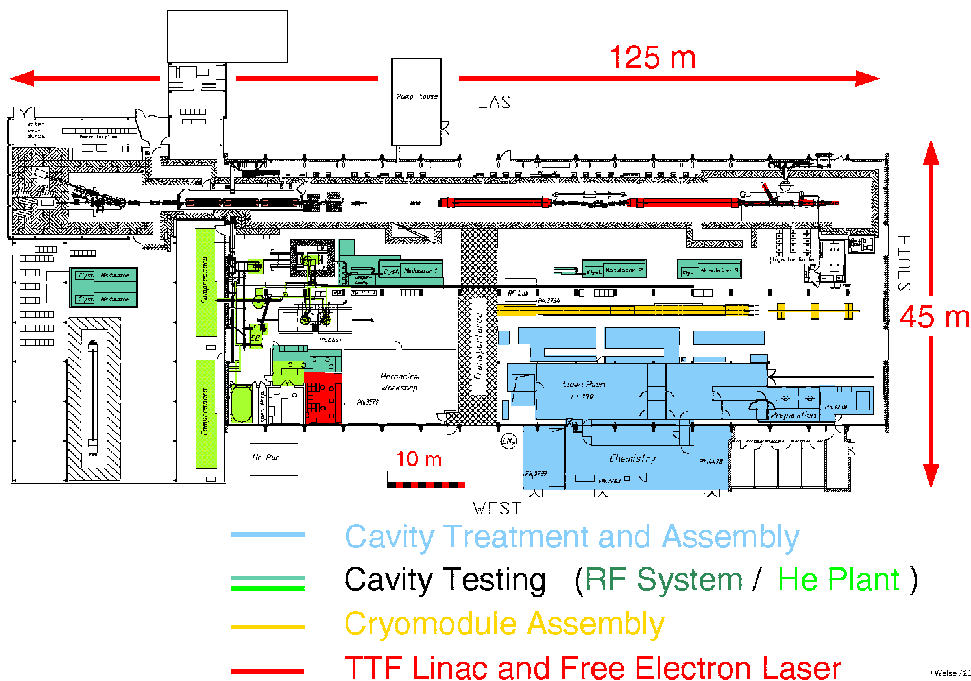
Layout of the TESLA Test Facility at DESY.
